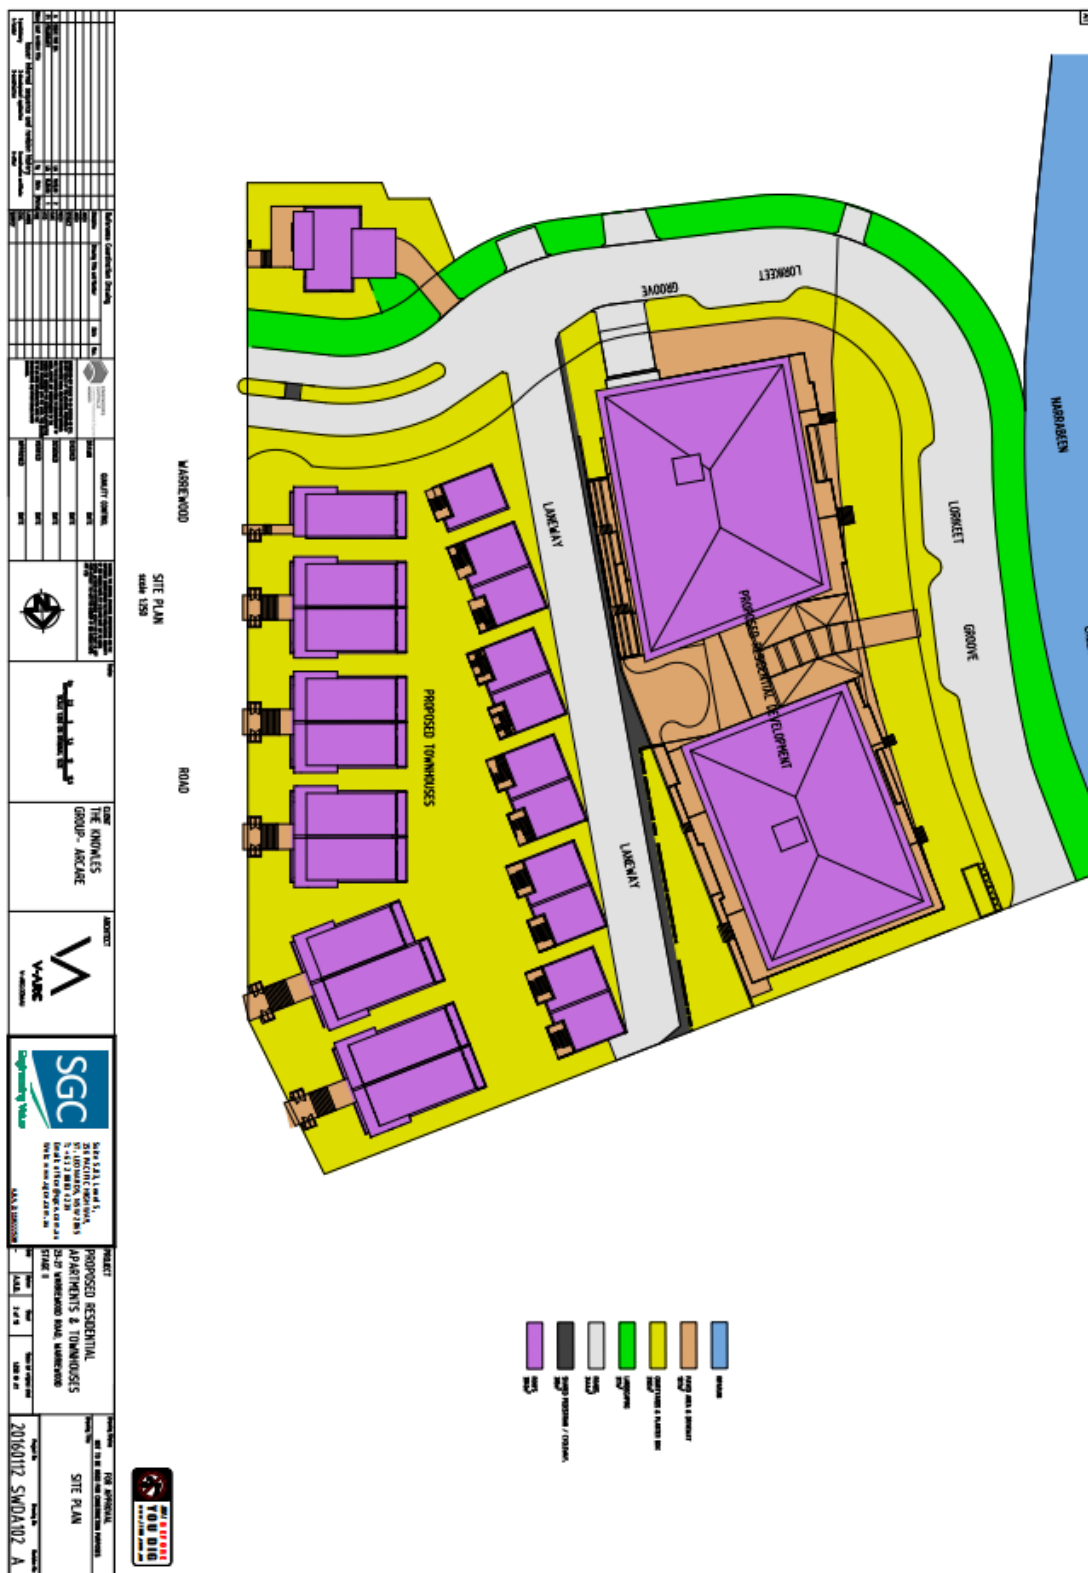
Proposed Land Use (full size copy in set of stormwater plans)
